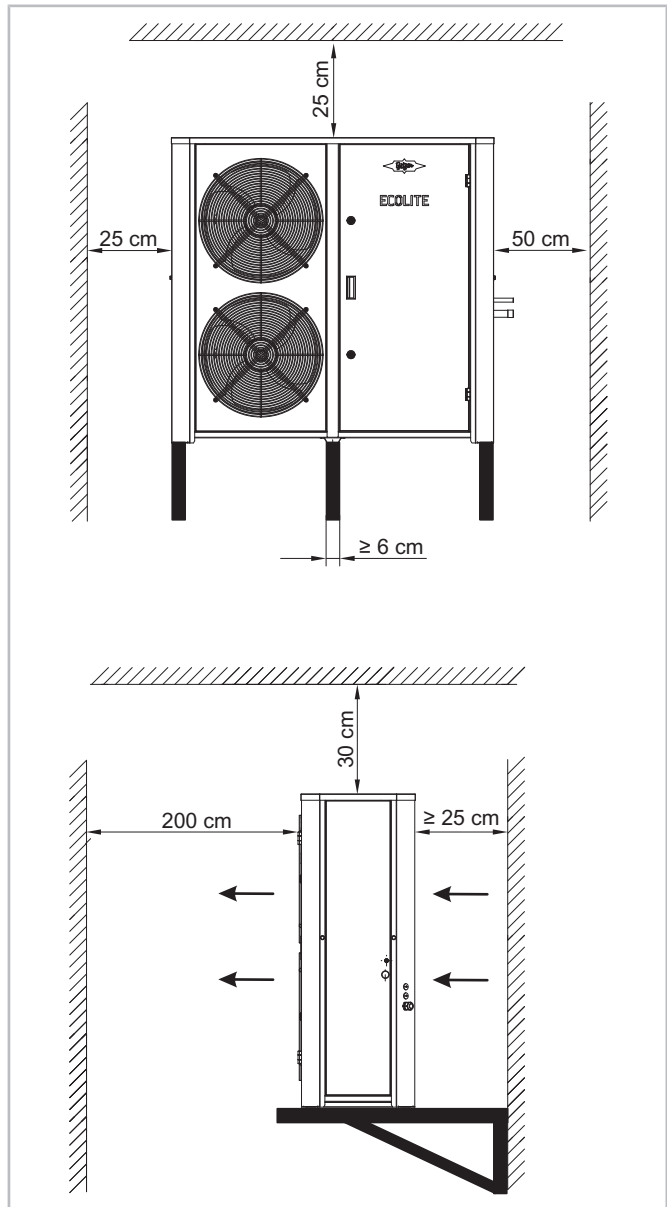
Minimum distances to the wall and ceiling when mounted on a mounting bracket (example shows LHL5E/ ..)
